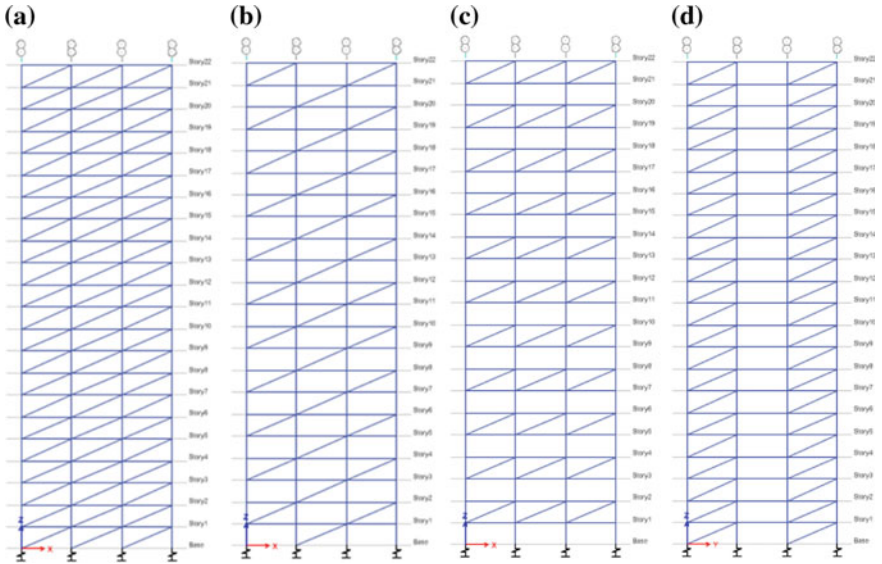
Elevation of 22 storey diagrid buildings with eccen forward bracing pattern arrangement (a whole, b alternate, c horizontal, d vertical)
